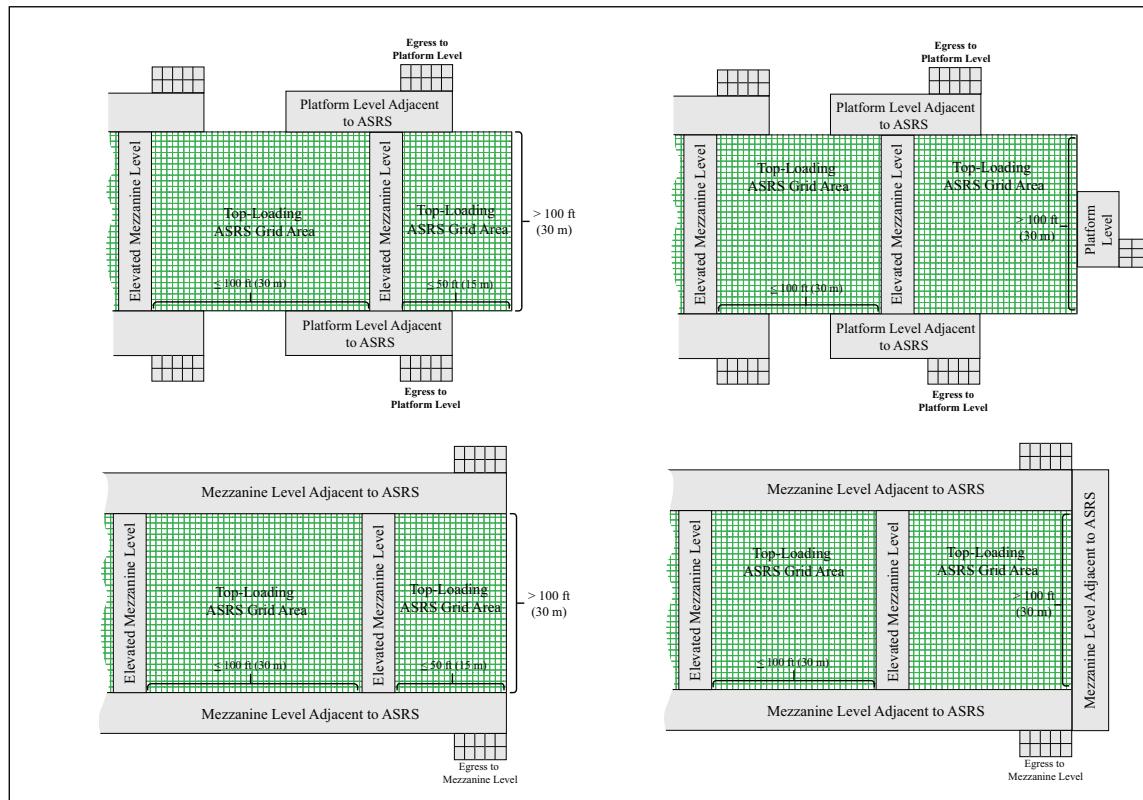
Example of solid-floored elevated mezzanine levels when span of TL-ASRS exceeds 100 ft (30 m) in each direction
